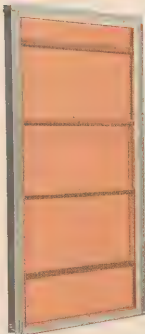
DETAILS OF CONSTRUCTION — STANDARD TYPES AND SIZES
